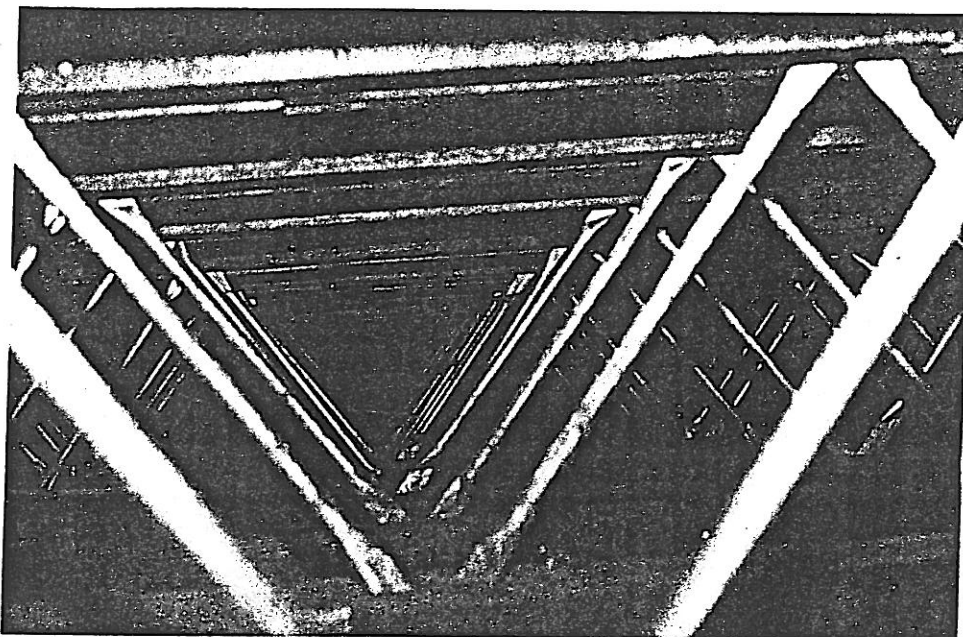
FLOOR TRUSSES LOOKING EAST SHOWING
